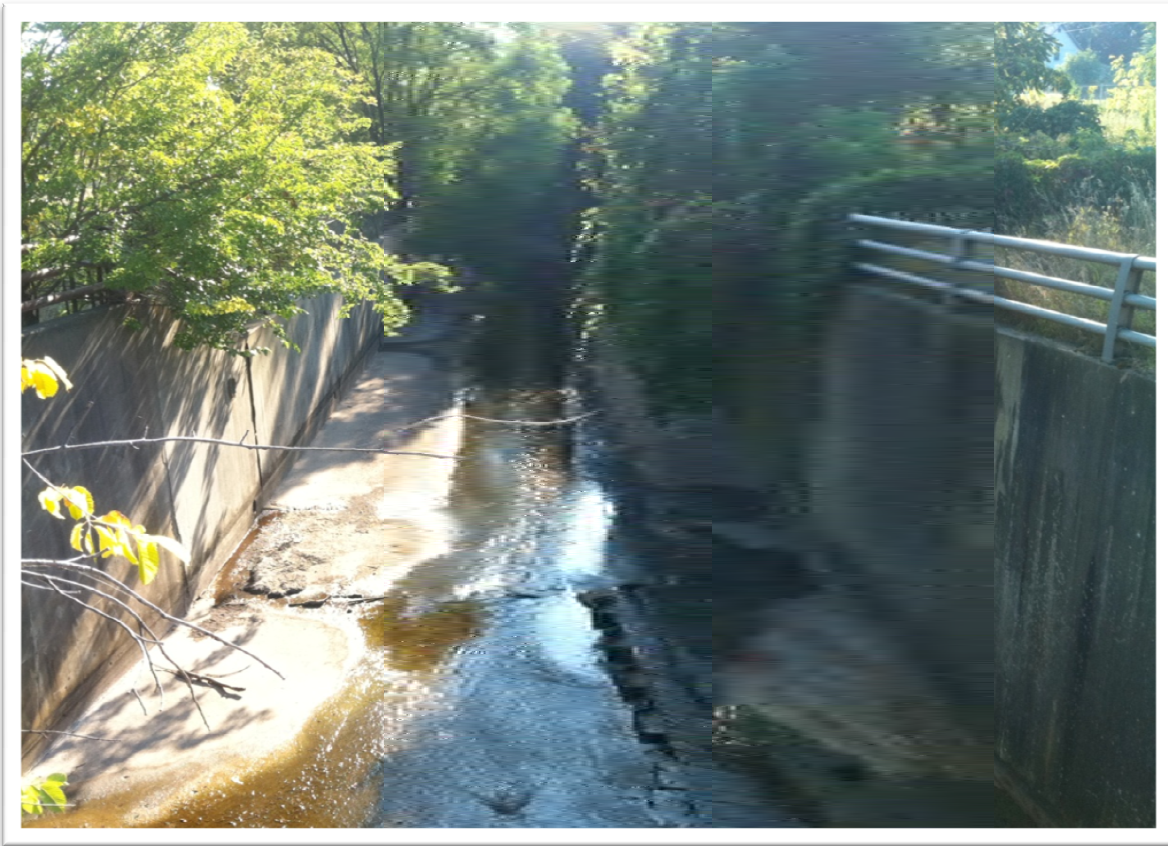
Pontiac Concrete Channel Cross-Section
